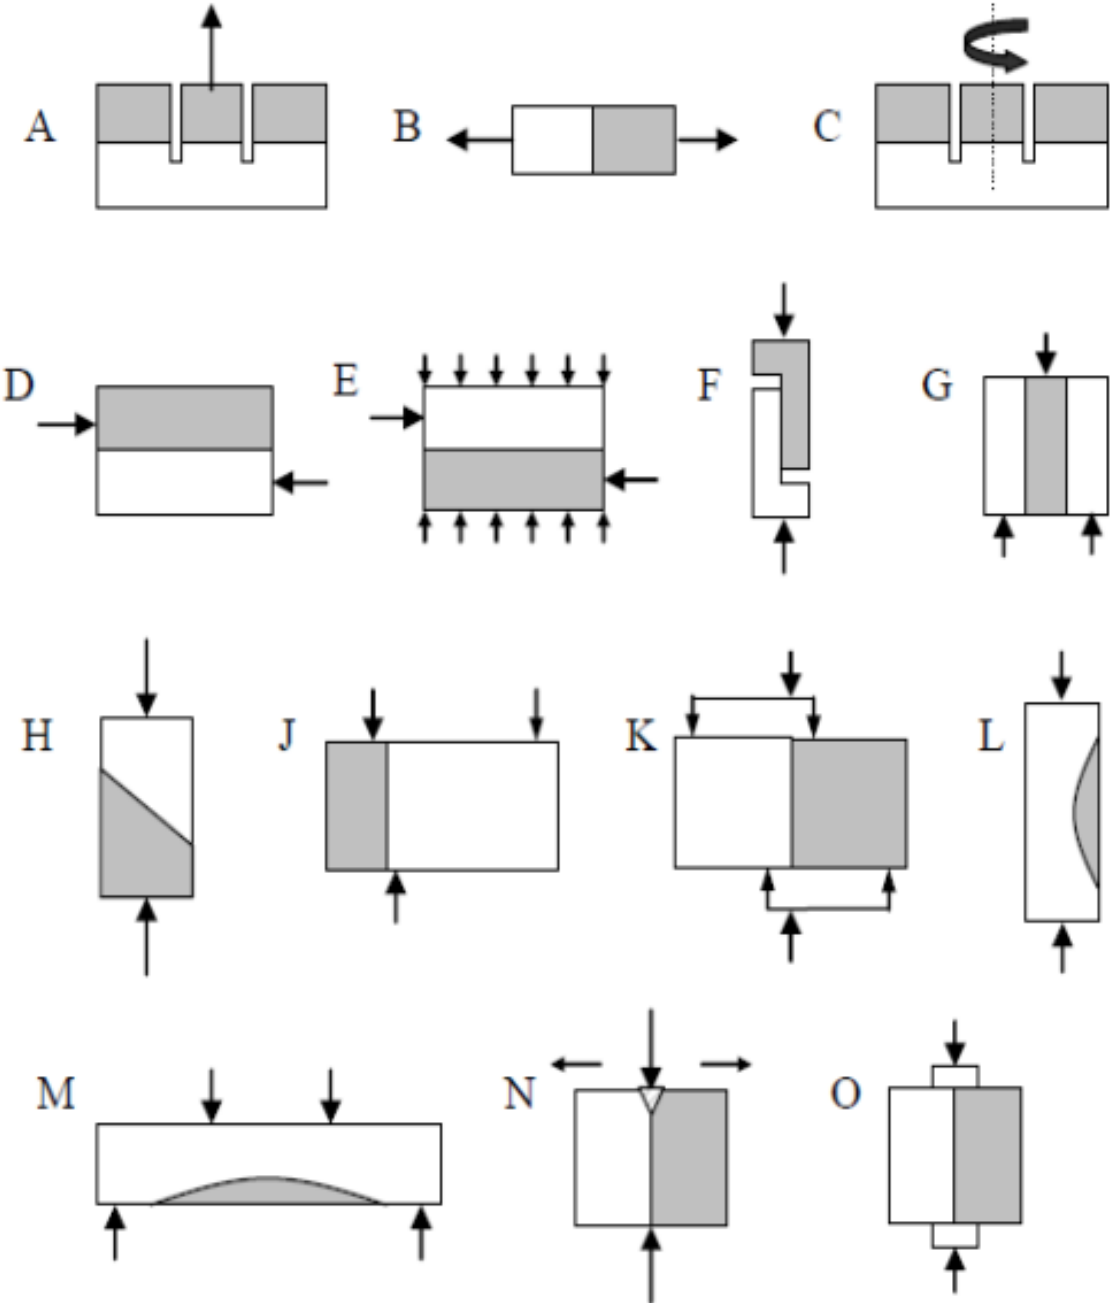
Different techniques to characterize the adhesion of repair mortars [205,206].
